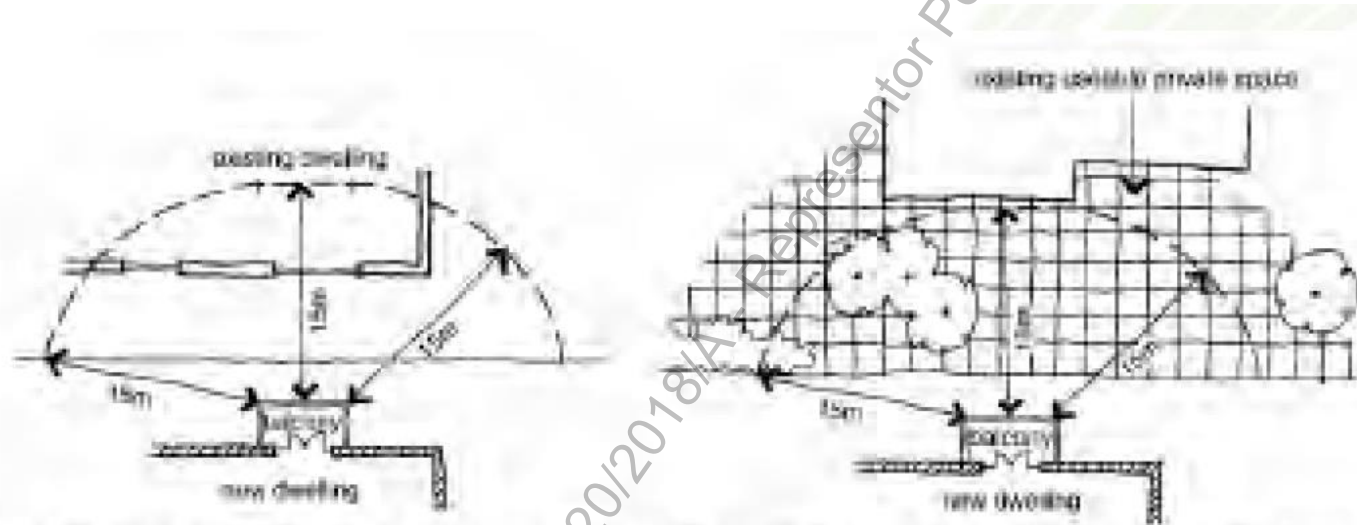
direct view occurs if windows or outdoor areas overlooked are located within a horizontal distance of 15 metres from any point of the balcony or deck.
